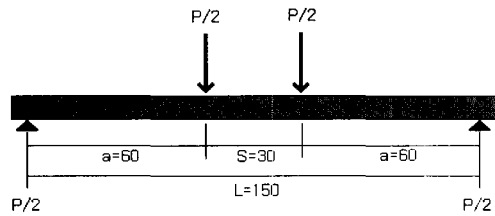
Four-point bending test configuration. P = load, Dimensions : cm
